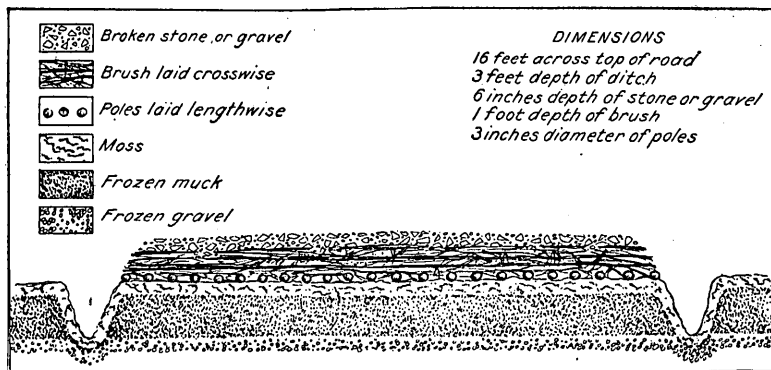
Method of constructing road over frozen muck, Klondike.
